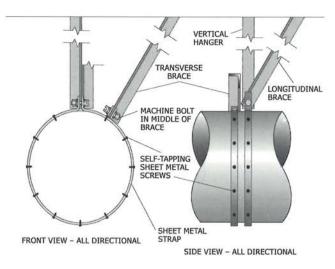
Round duct with vertical steel shapes with steel shaped bracing (all-directional).
